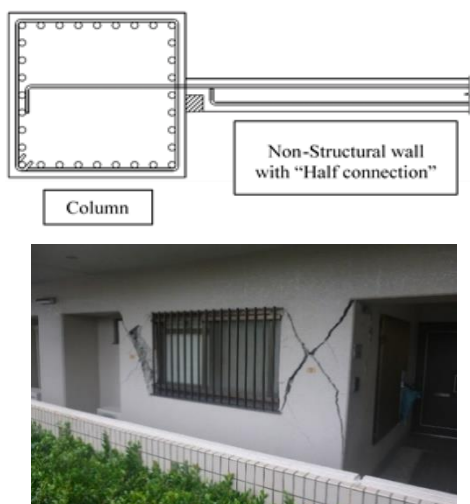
Typical non-structural wall connection and example of damage to non-structural wall (see Appendix A2).
